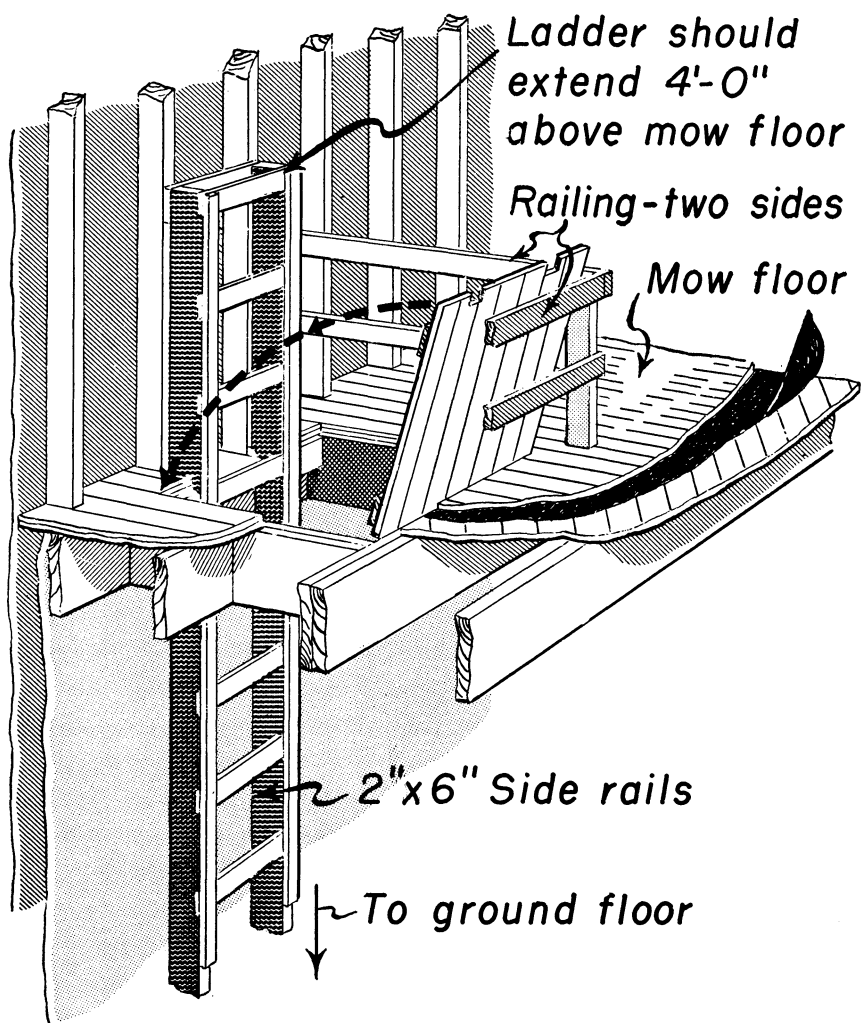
A tight door between the lower floor and the mow provides fire protection by preventing drafts.
